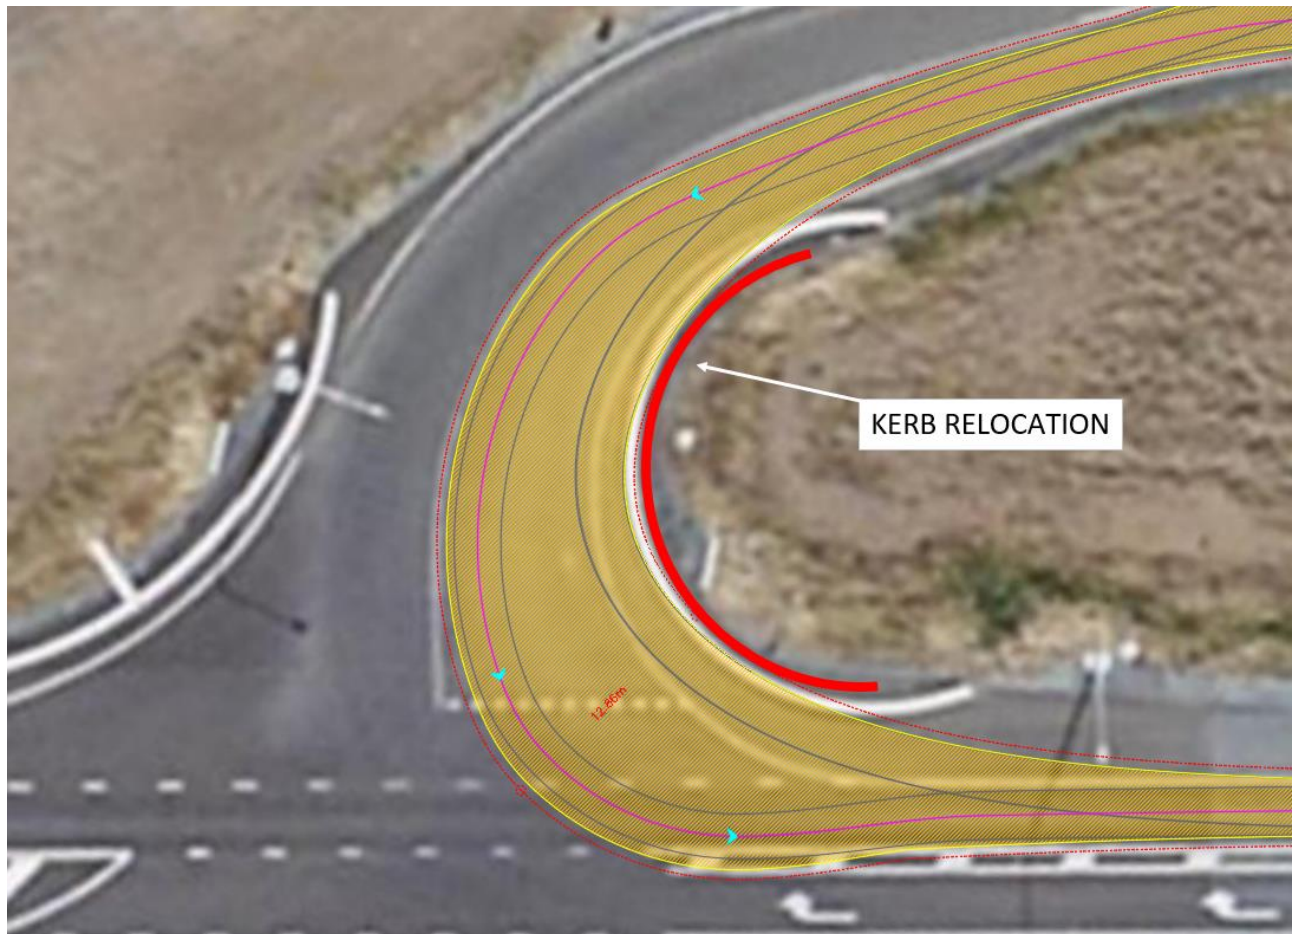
Kerb relocation on corner of Capricorn Highway / Third Street intersection
